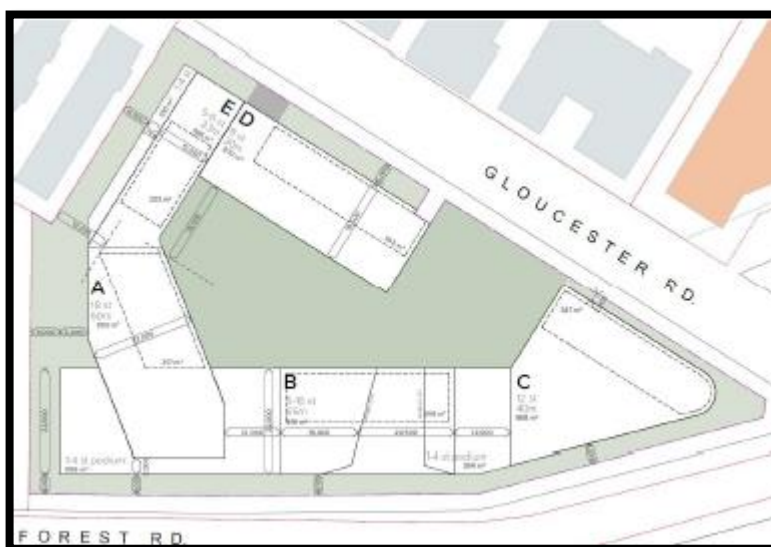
Building Envelope within the Site (Source: A Sutherland)
